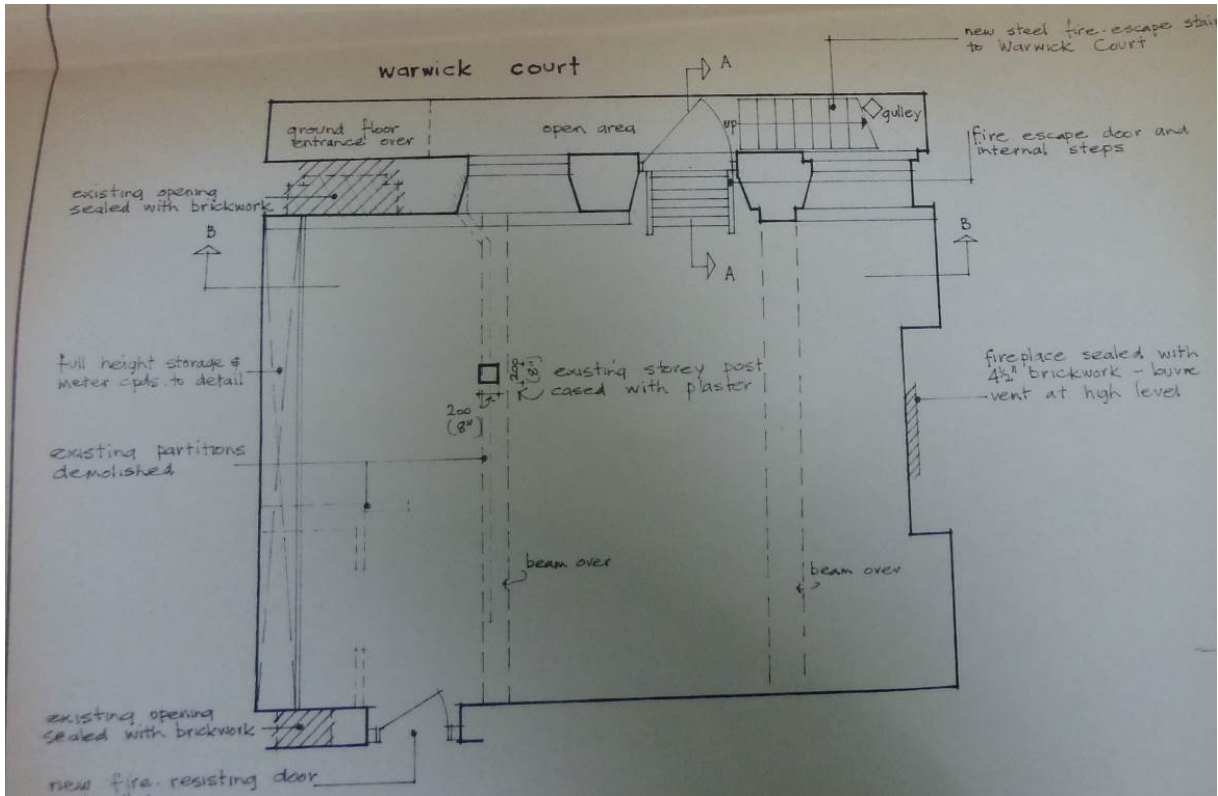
The front basement room as proposed in 1975, Cuthbert Lake & Clapham (LB Camden, planning file)
